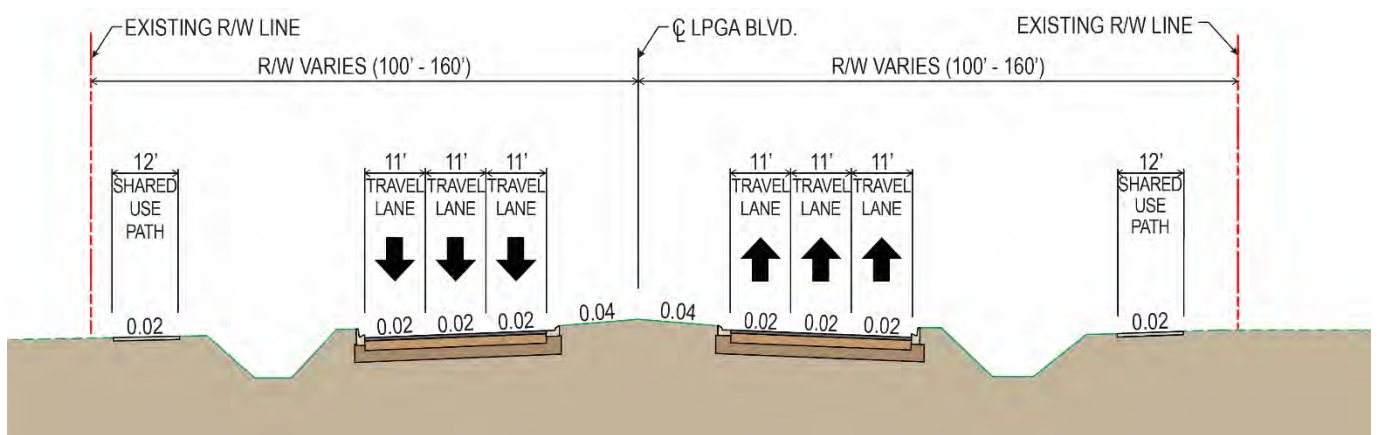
Proposed Typical Section from Tymber Creek Road to Williamson Boulevard
